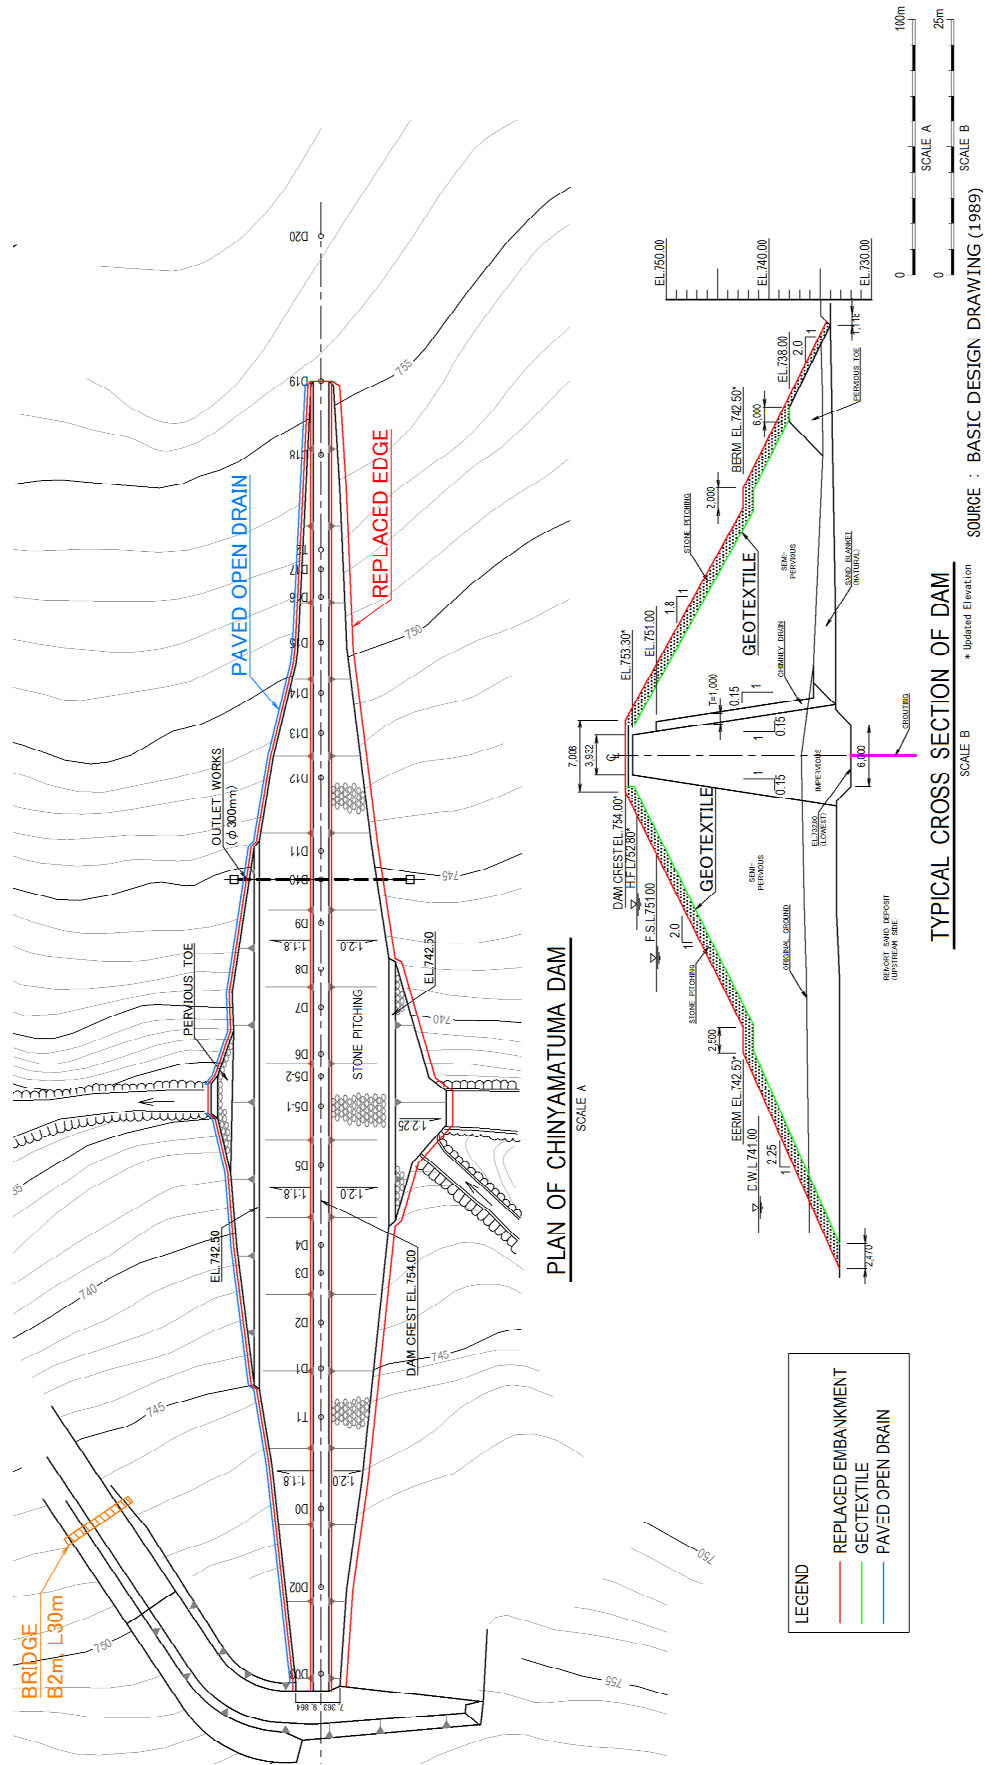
A Typical Cross-Section and Plan of the Embankment (Chinyamatuma Dam)
